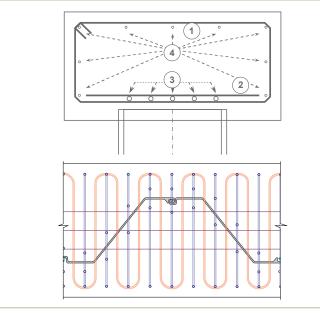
Simple connection reinforcement detailing (top: cross section; bottom: plan view).
